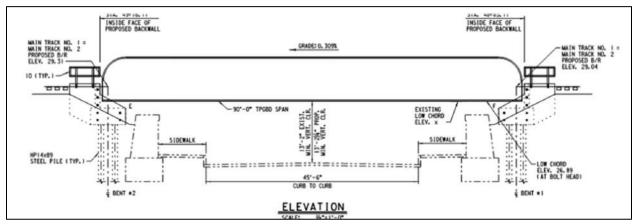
Elevation Drawing for Maintaining Existing Limestone Abutments as Retaining Walls While Constructing New Abutments
